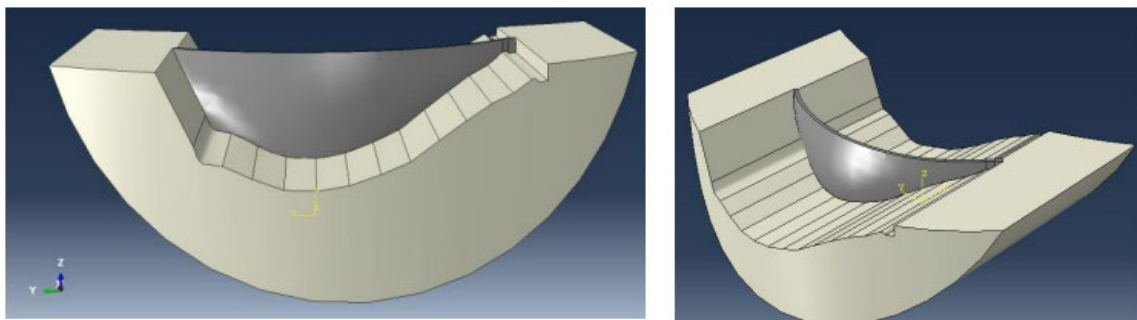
Illustration of the layout of the concrete arch dam and its abutments and foundation
